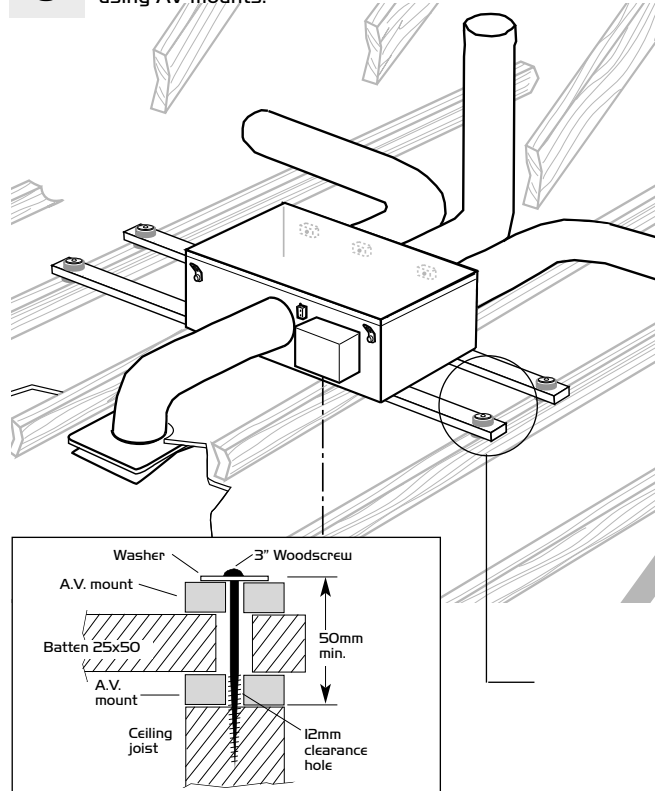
Air handling unit shown mounted on roof joists using AV mounts.
